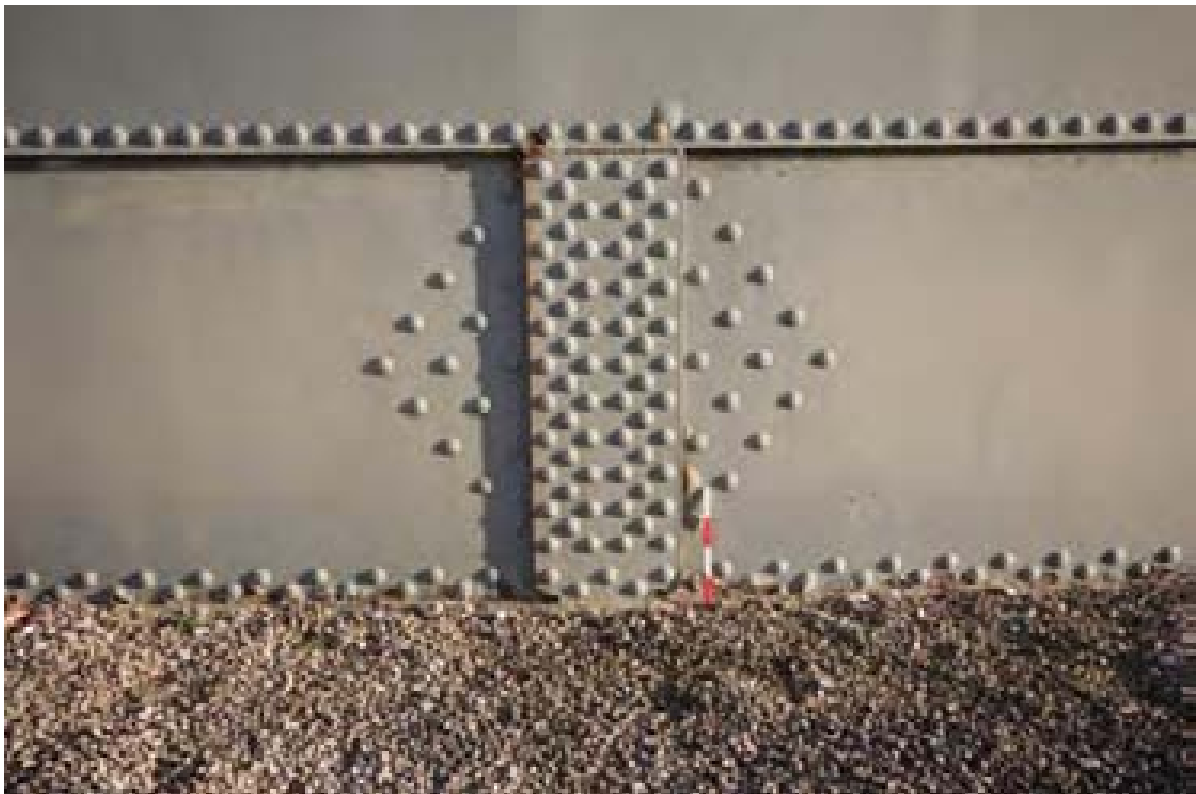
Riveted buffer sheet at base of the tank, Gasholder 6 (PPD16-0009)
